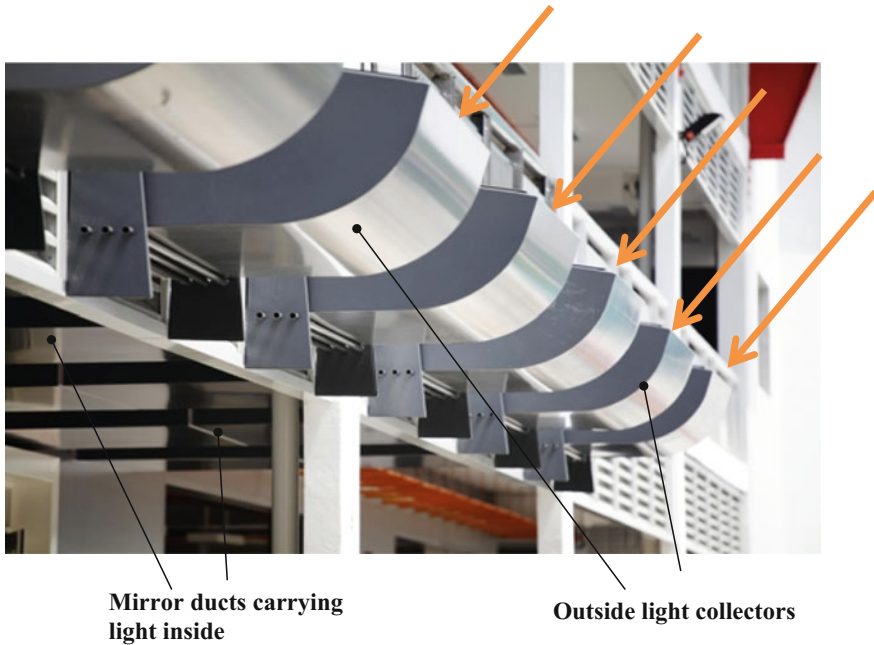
Photo of a mirror duct light collectors installed at a building in Singapore
